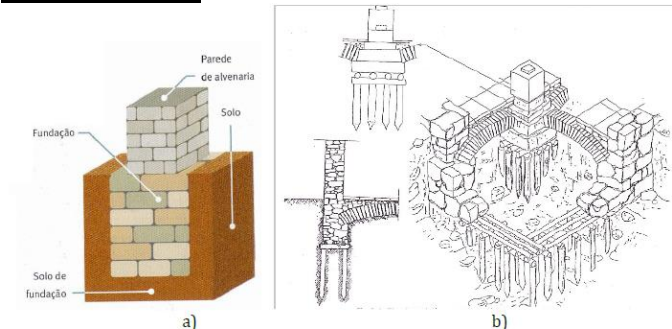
a) Common foundations of old masonry buildings; b) Foundations of Pombalino buildings
